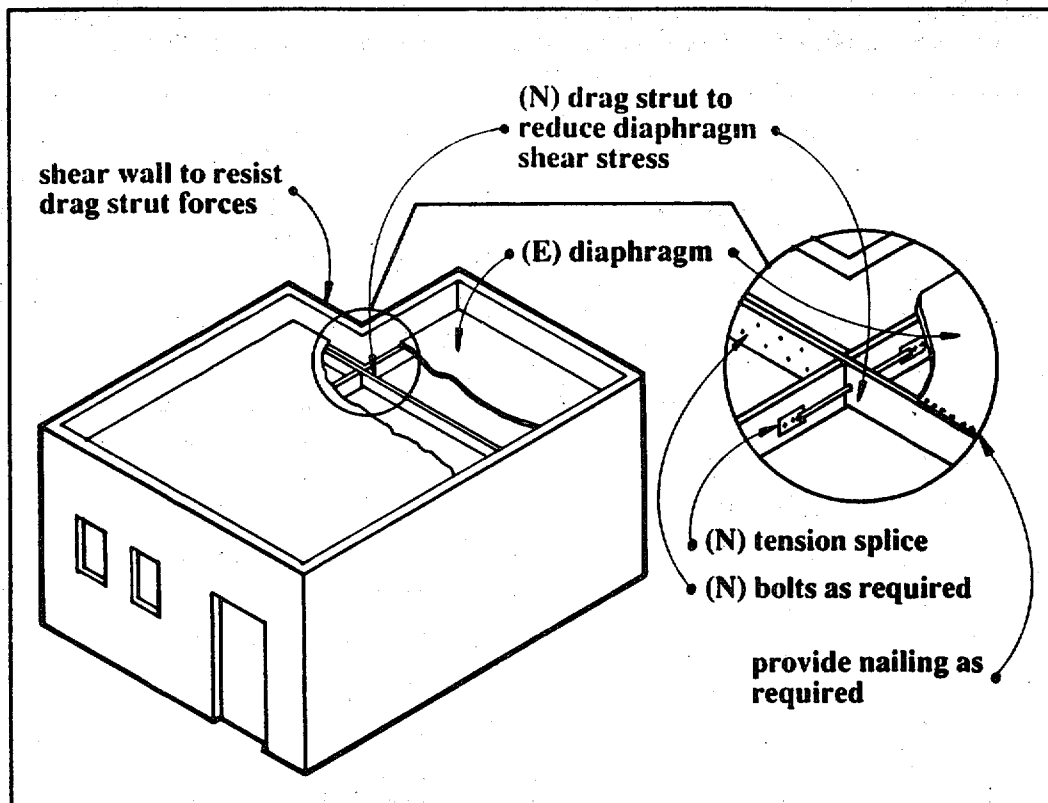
New drag strut in an existing wood diaphragm.
